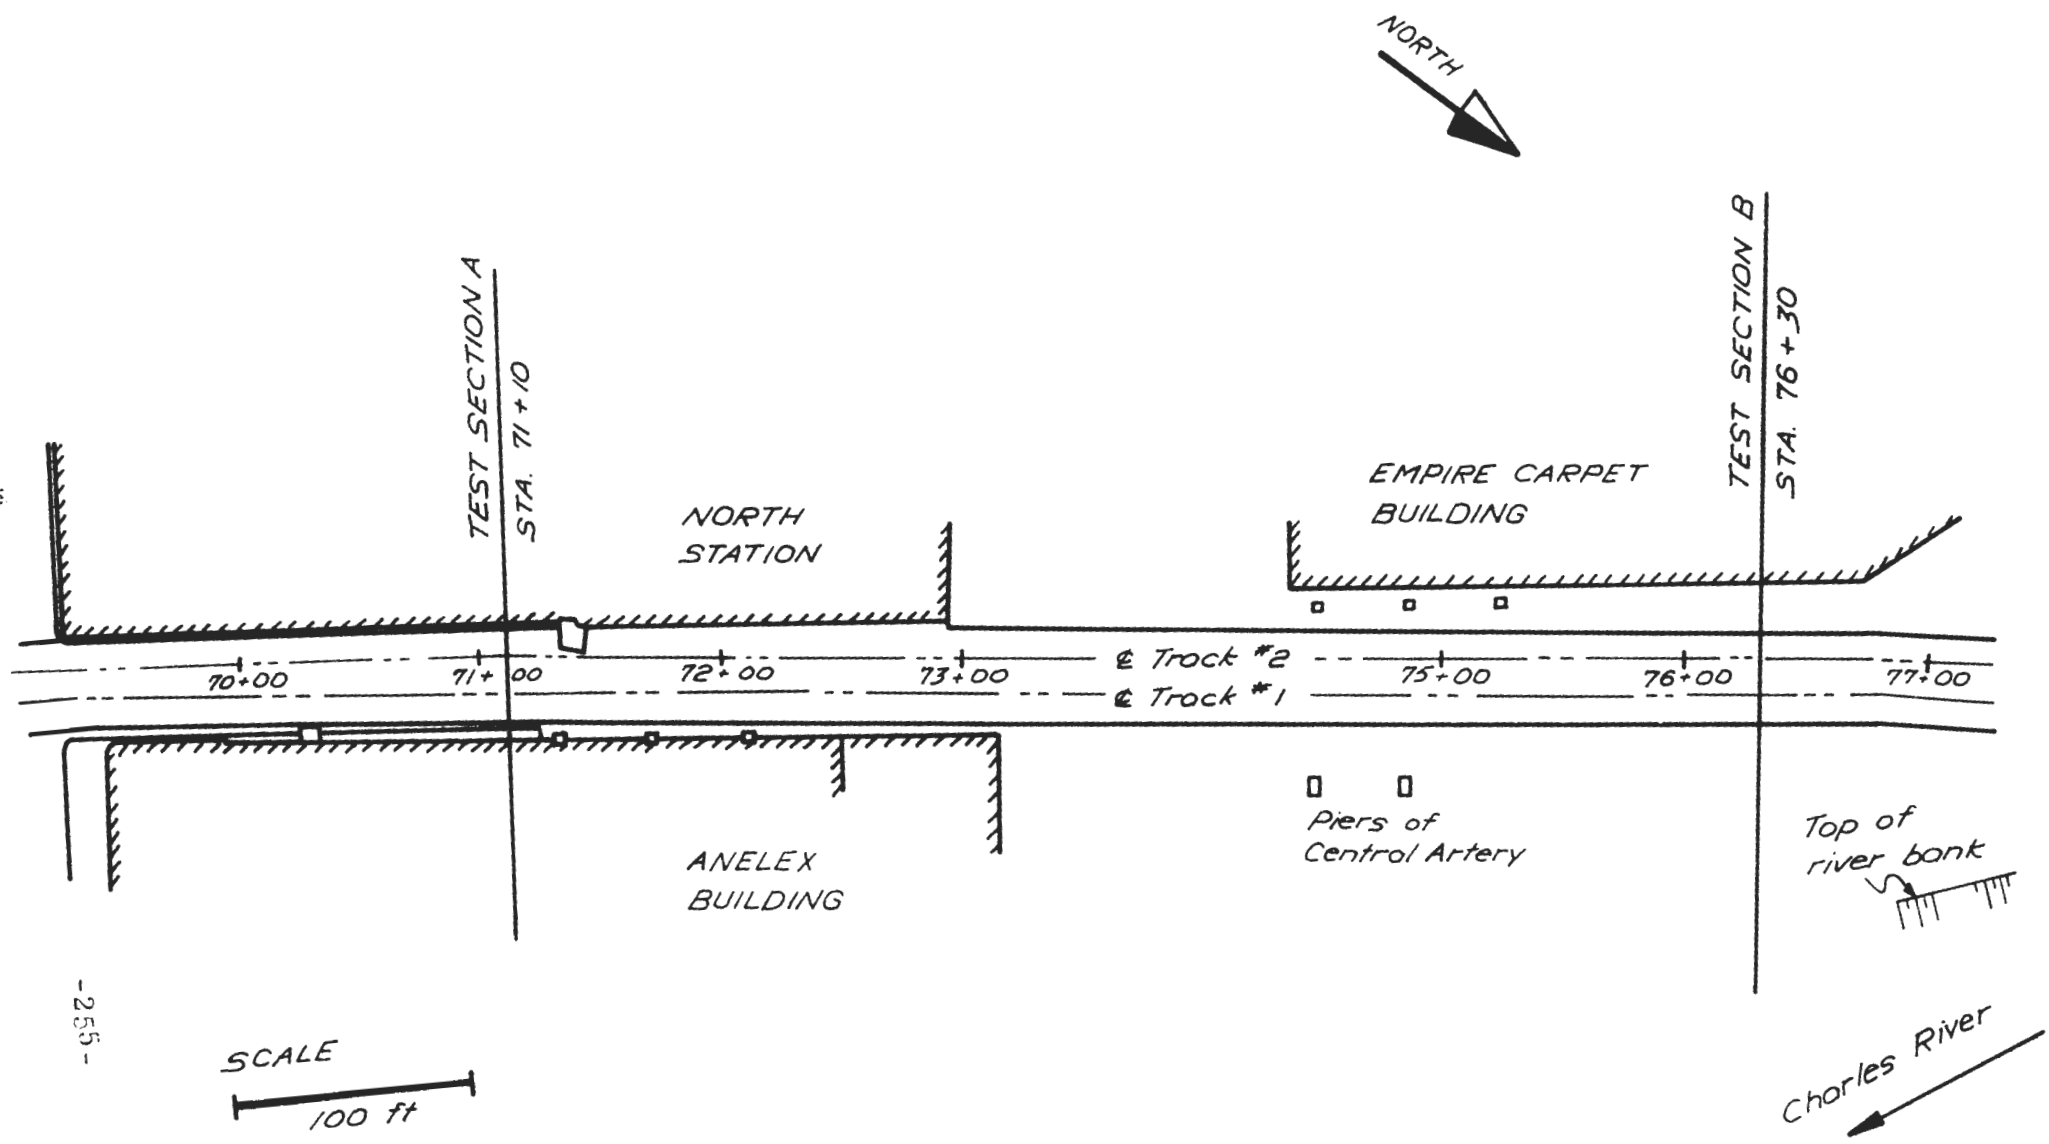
PLAN VIEW OF SUBWAY EXTENSION
